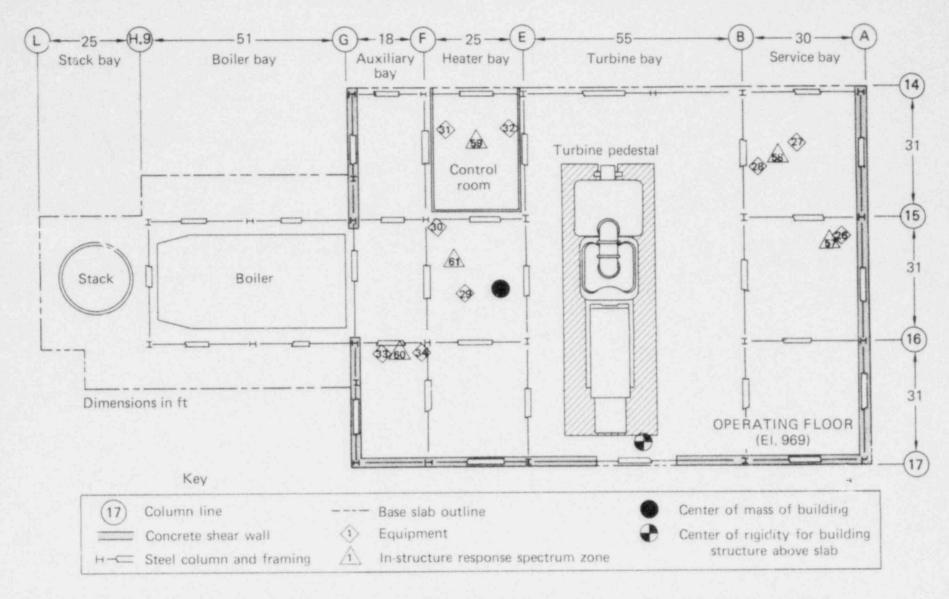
Schematic plan view of the Unit 4 operating floor (El. 969 ft) shows shear walls, column lines, equipment locations, and locations where in-structure response spectra were generated. See Table 11 for the identity of each equipment item.
